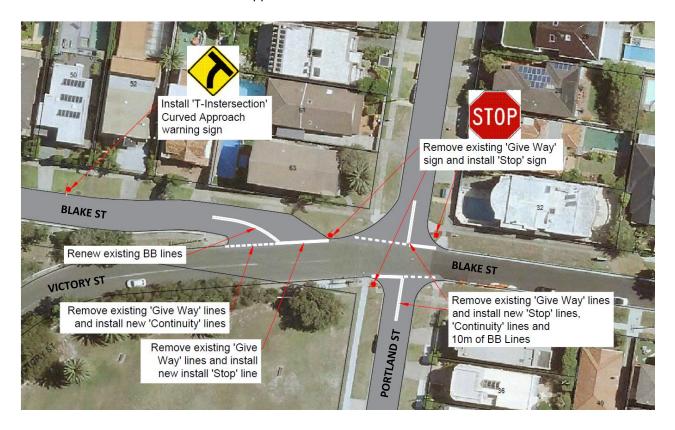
Proposed changes to controls at the intersections of Blake Street and Victory Street and Blake Street at Portland Street, Dover Heights.
